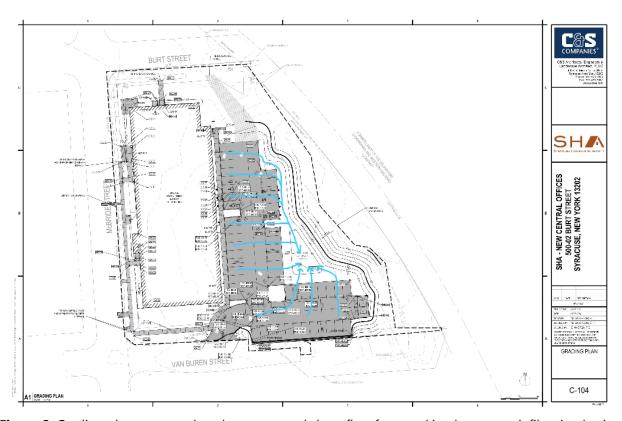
Grading plan annotated to show proposed sheet flow from parking lot area to infiltration basin.
